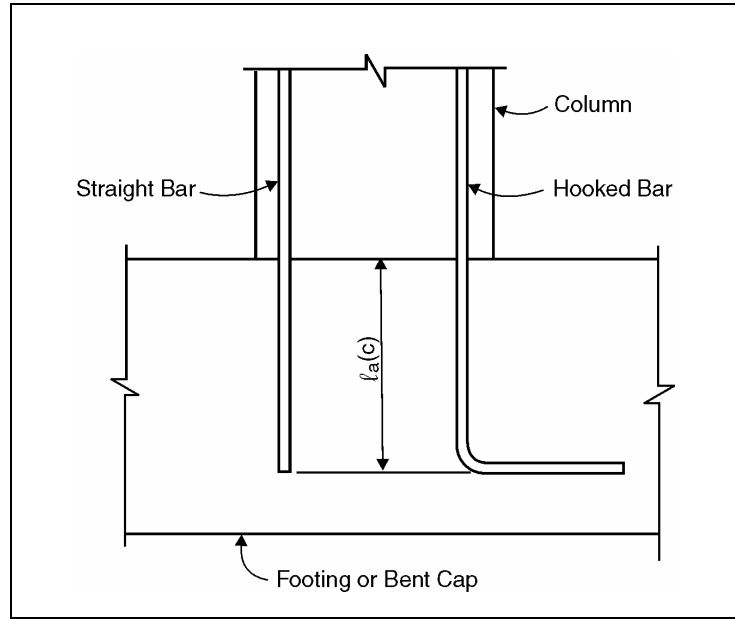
Effective anchorage length of longitudinal reinforcement.
